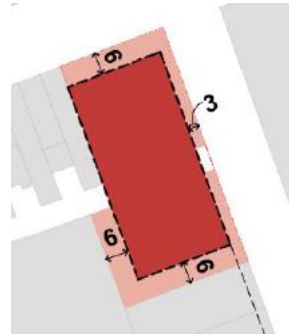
Levels 6-13 – commercial – 3m setback to Victor Street with approximate alignment with the Sebel Tower, 31-37 Victor Street to the south
